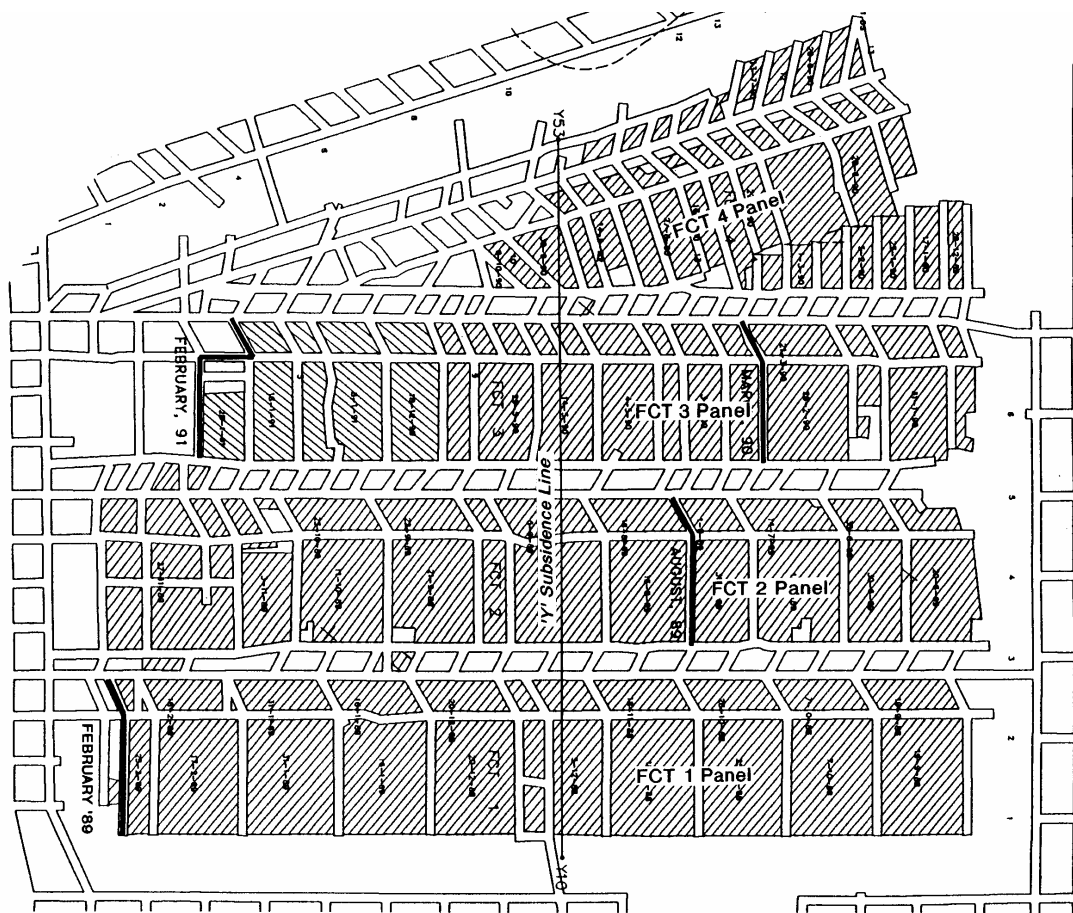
Plan of Subsidence Lines Over FCT Panels at Wallarah Colliery
